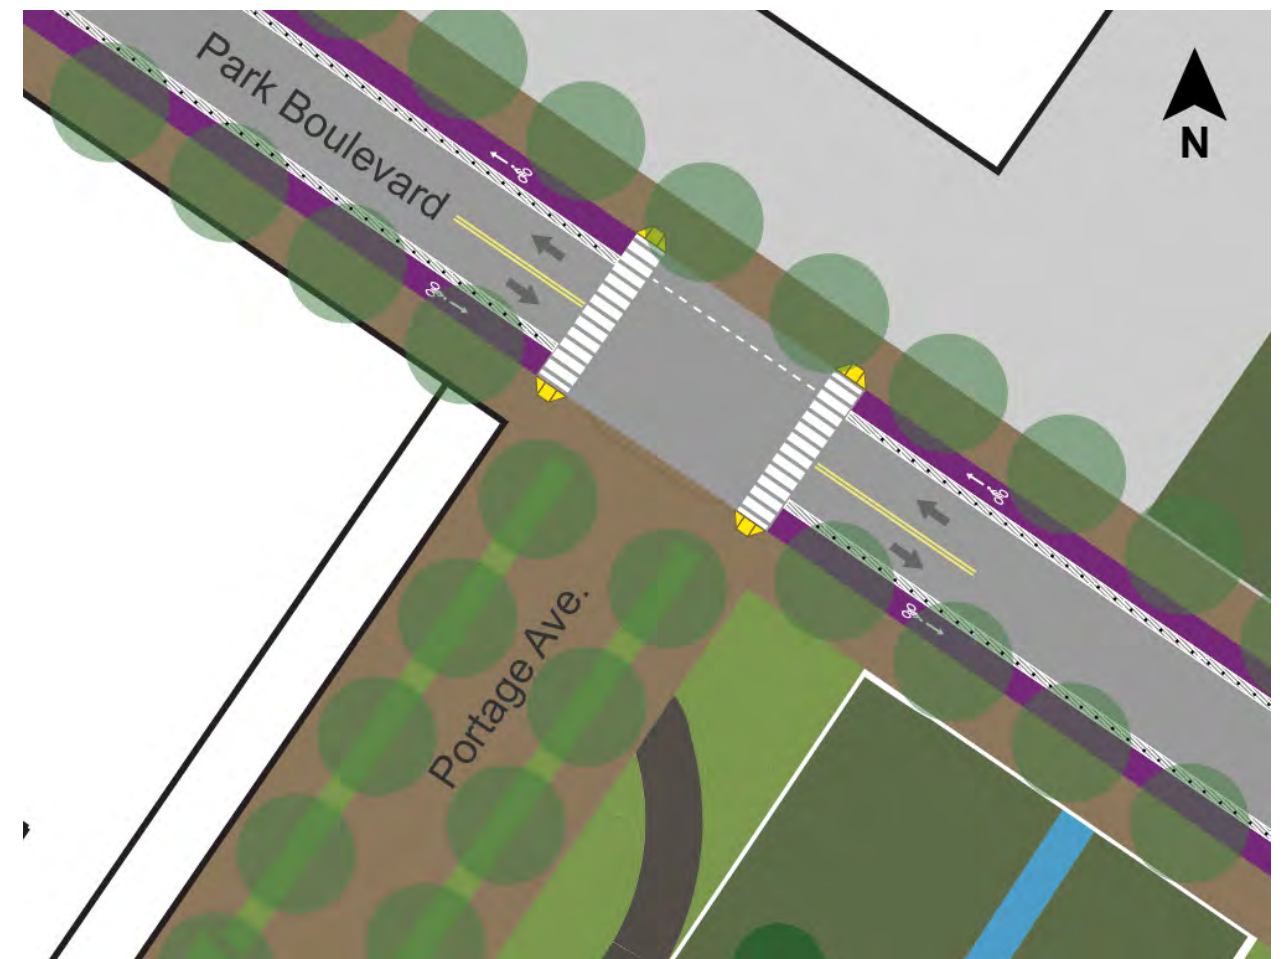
Park Boulevard and Portage Avenue Conceptual Intersection Design
